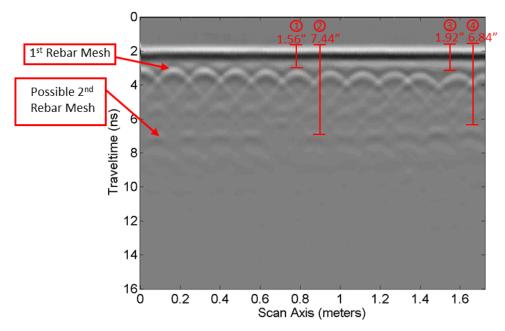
GPR Image (File 144), corresponds to a GPR scan on Area 3 on Bridge 76. Parallel to steel bridge deck girders.
